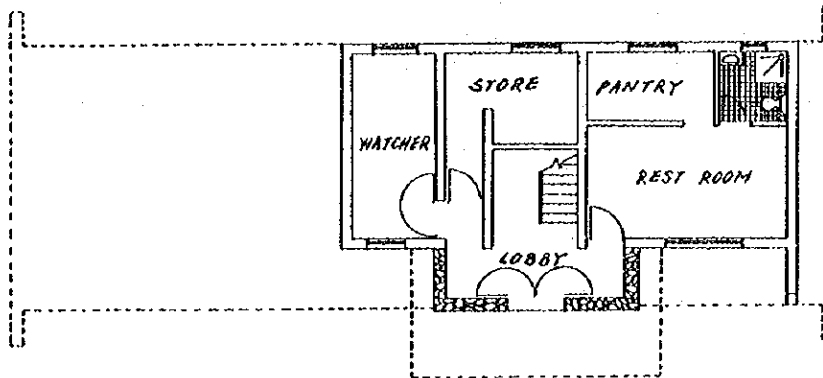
Plan (1st Story) of Type O Radio Repeater Station
